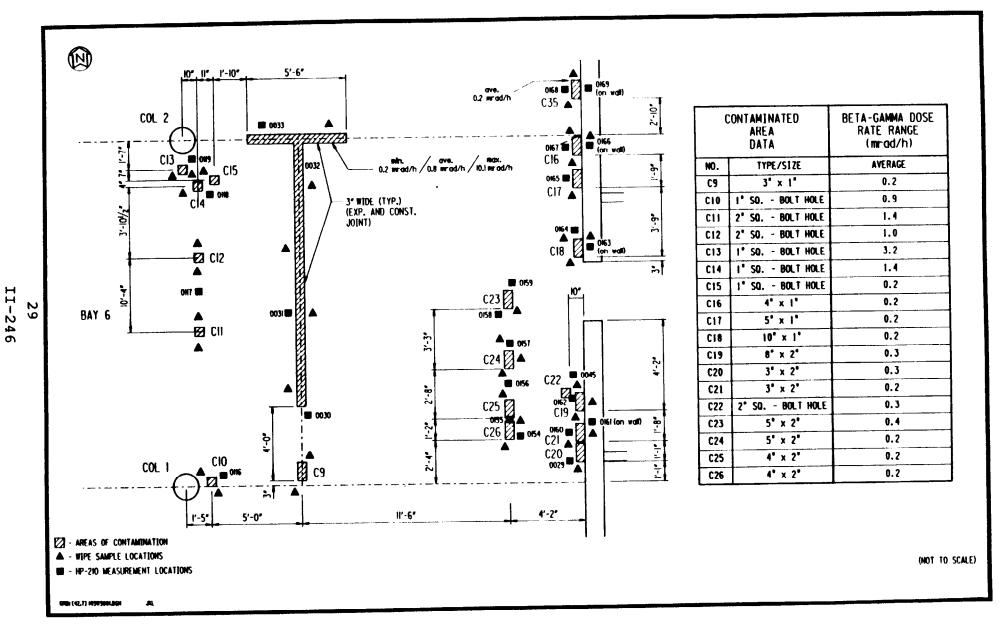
AREAS OF CONTAMINATION - BAY 6 (ROOM 1, FIRST FLOOR)
